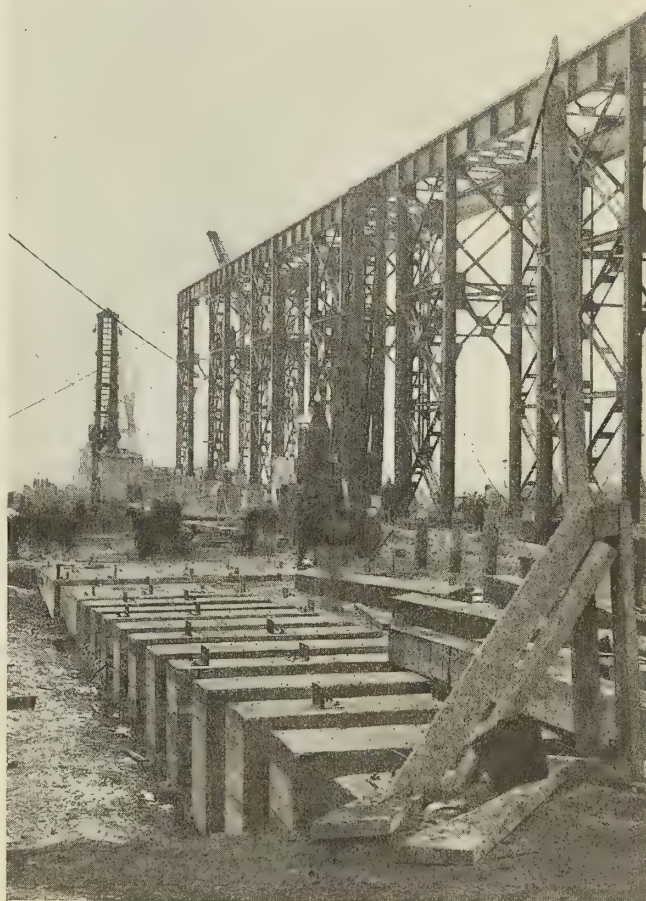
Showing Permanent Character of Concrete Foundation for Shipways
